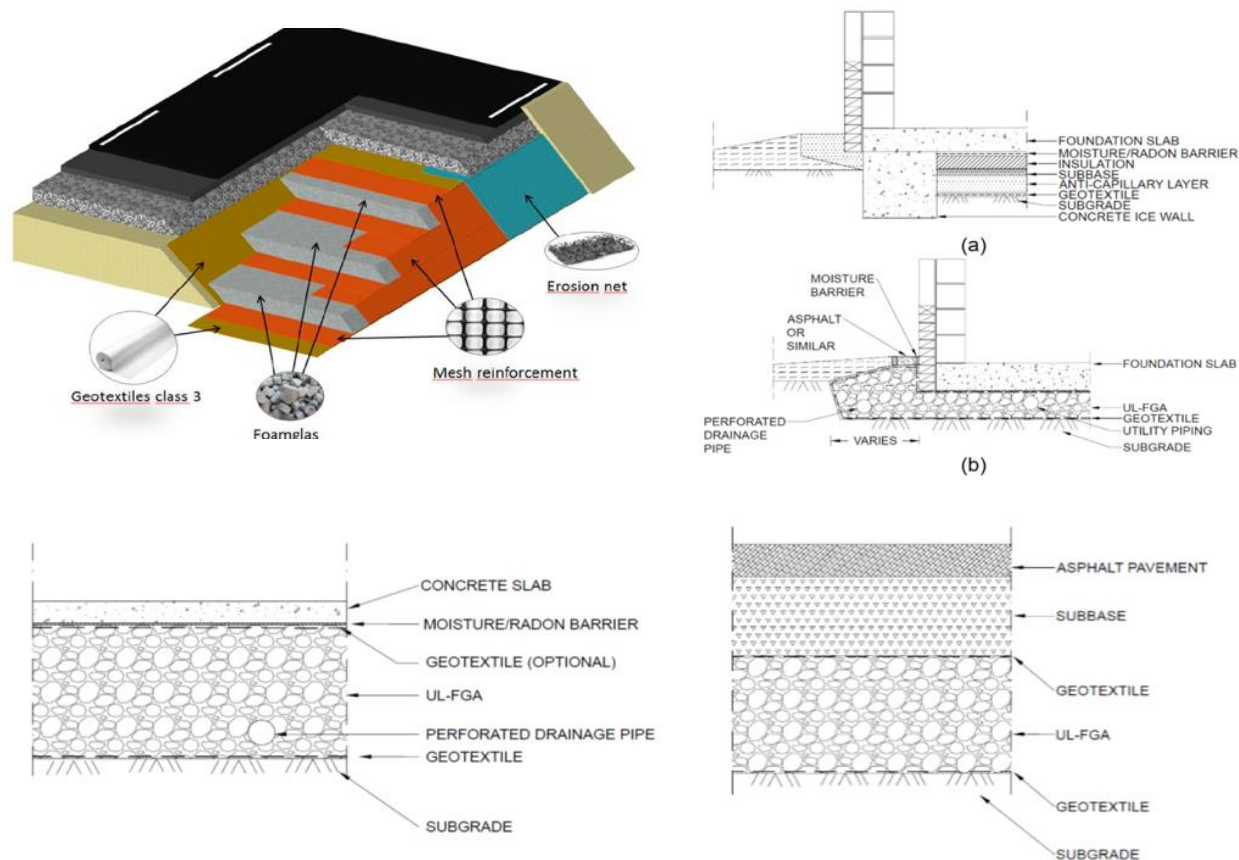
Example applications of FGA in highway construction: (Top-Left) slope repair; (Top-Right) retaining wall; (Bottom-Left) foundation slab; (Bottom-Right) pavements.
